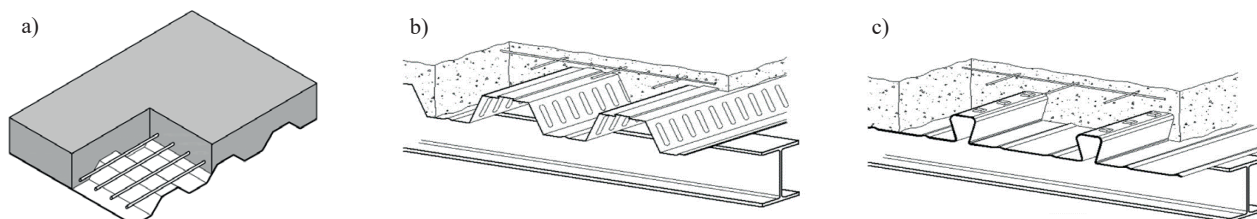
Examples of a composite slabs with profiled steel sheet bonded: a) by welded bars; b) mechanical; c) frictional
